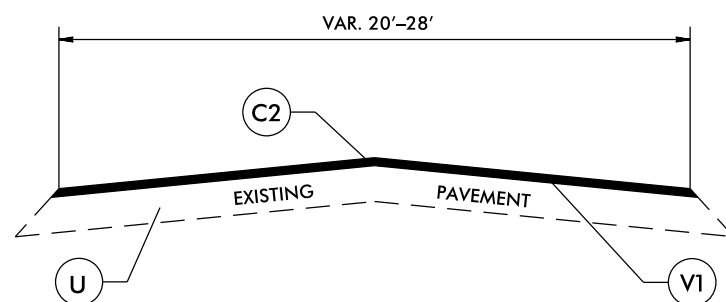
DETAILS OF PATCHING EXISTING PAVEMENT PRIOR TO RESURFACING
